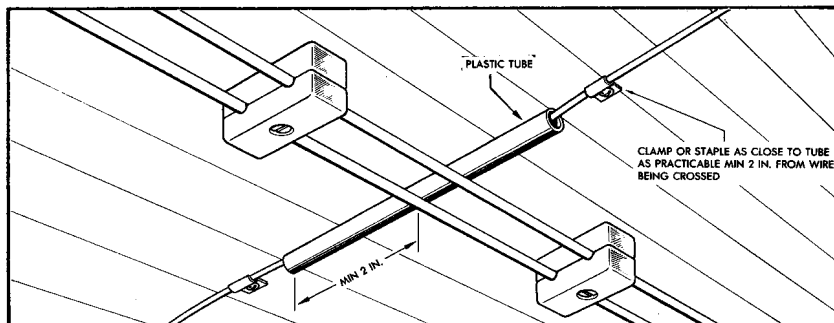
Station Wire Crossing Open Electric Light Wires (Drawing 1 of 2)
